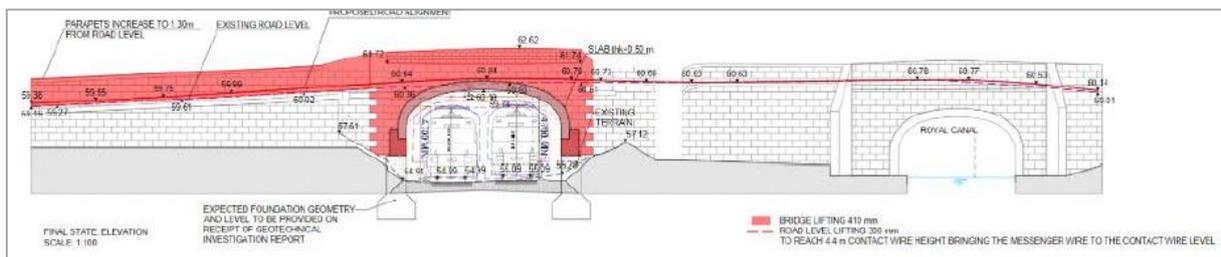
Deck reconstruction of the OBG5: precast arch deck solution
